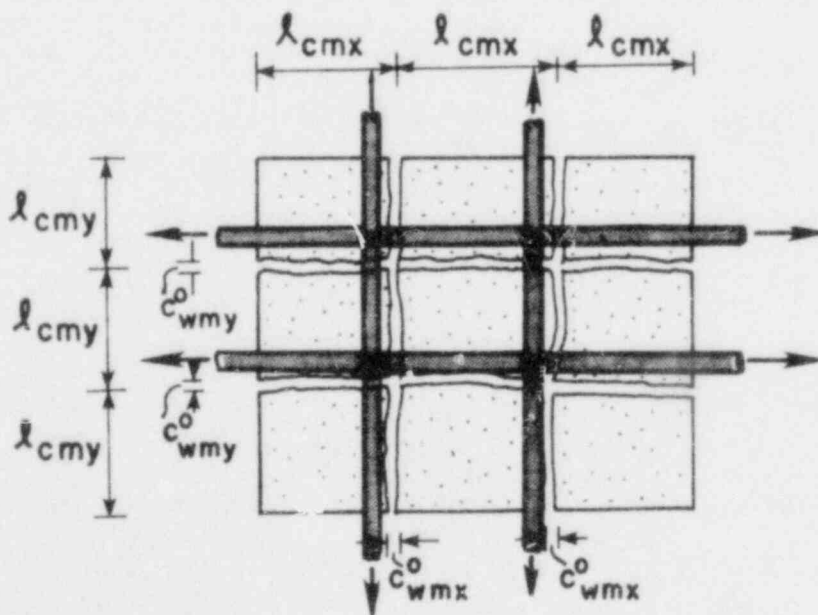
Idealized orthogonally cracked reinforced concrete element.
